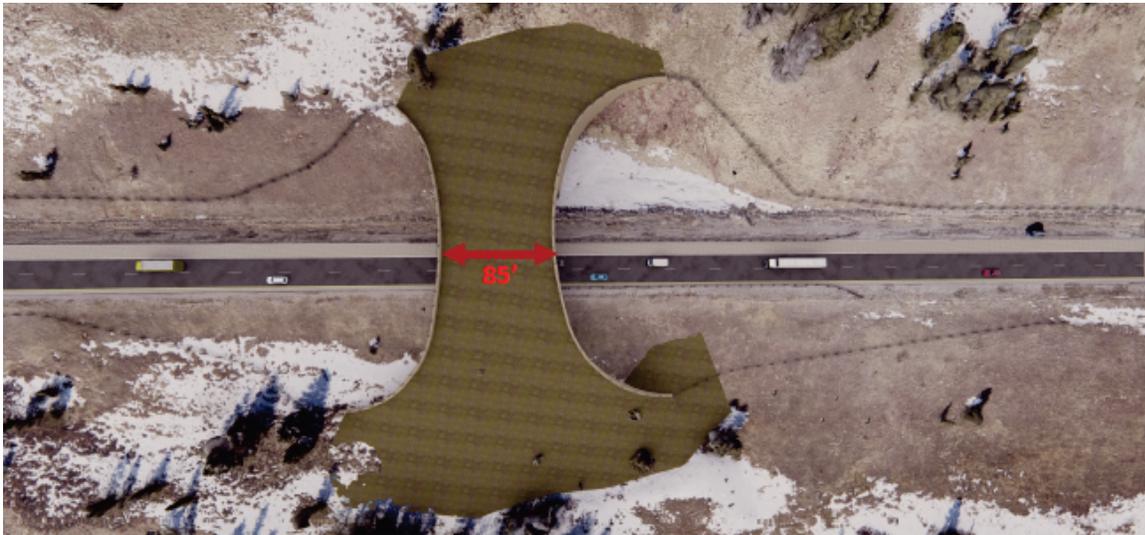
Area 3 Recommended Wildlife Crossing – Hourglass-Shaped Overpass
